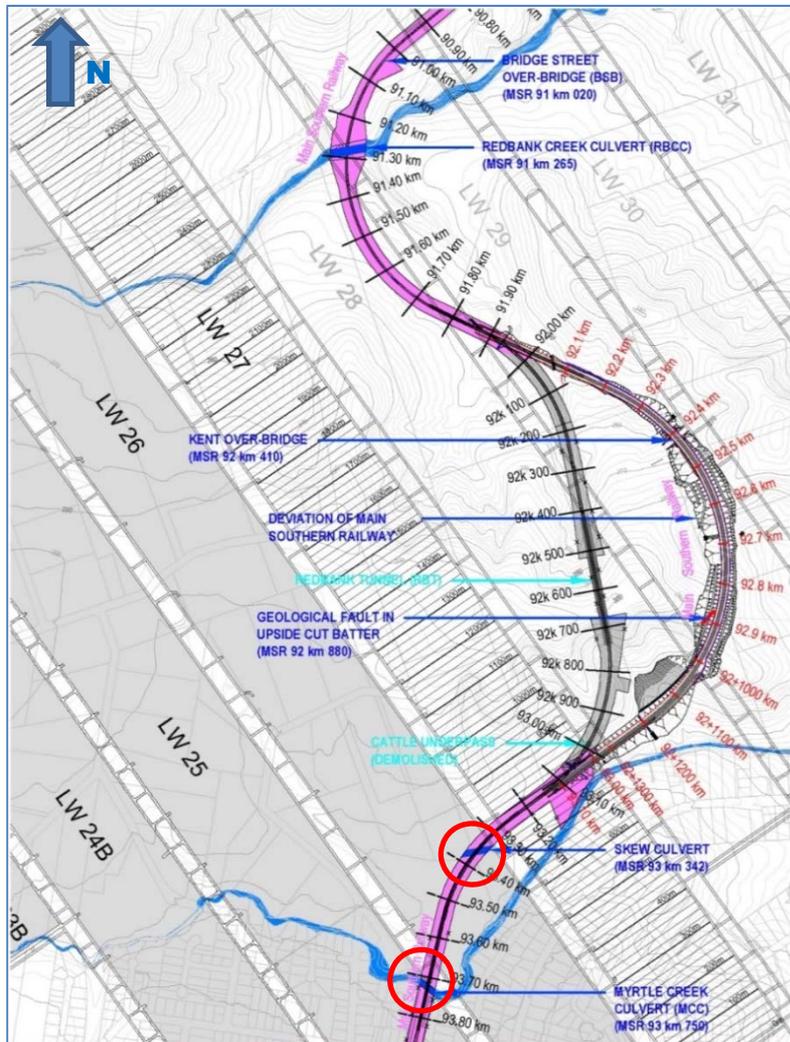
Location plan depicting underground mine plan and surface infrastructure with particular reference to culvert structures on the Main Southern Railway between Picton and Tahmoor about 90 track kilometres south of Sydney, NSW, Australia.
